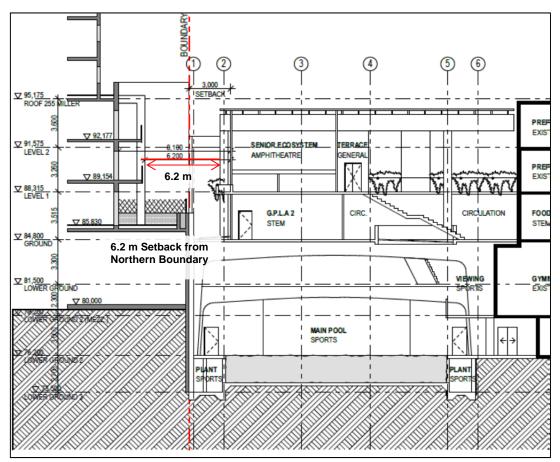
Section showing setback to adjoining residential apartment (267 Miller Street (Source: EIS)
